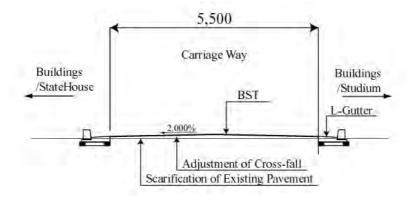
Standard Cross-Section: Tabonikabauea Road in Bairiki (2, without sidewalks)
